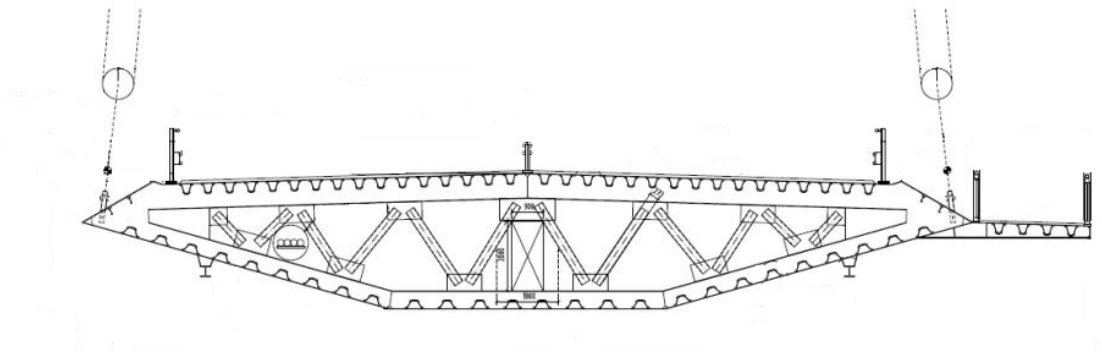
Bridge girder for Bjørnafjorden Bridge, with modifications[21]
